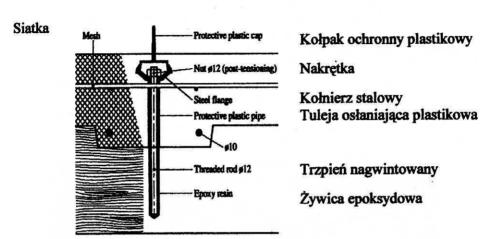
Adapted connector for the structural application of mixed timber concrete floor for multi-storey buildings [Natterer, Herzog 1991]
